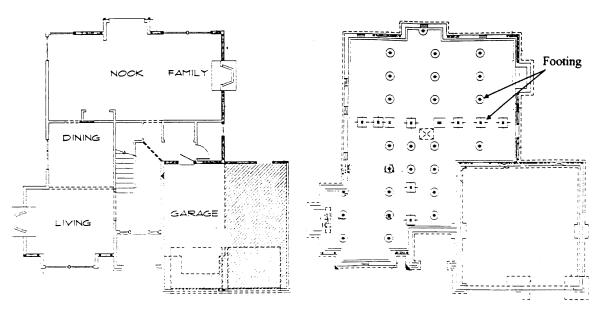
Main Floor and Foundation Plan in North America (Source: Mascord, 1997)
